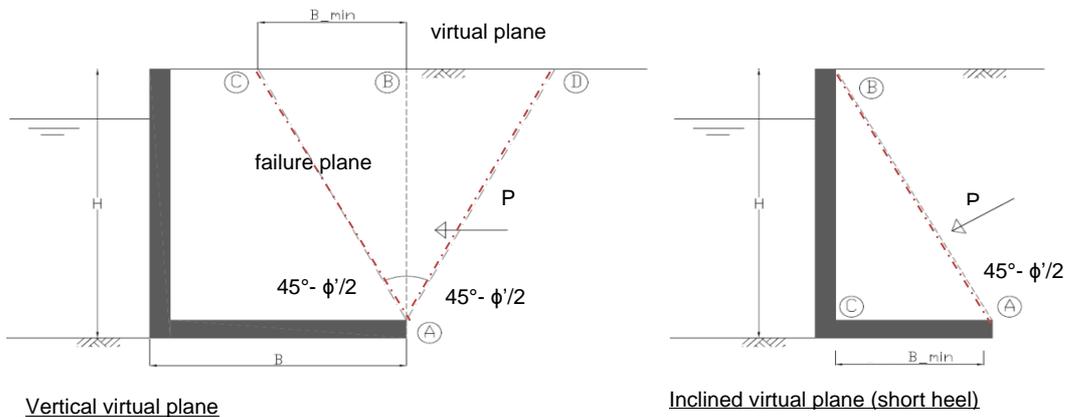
Soil wedge for cantilever walls (left: Rankine situation, right: short heel)
